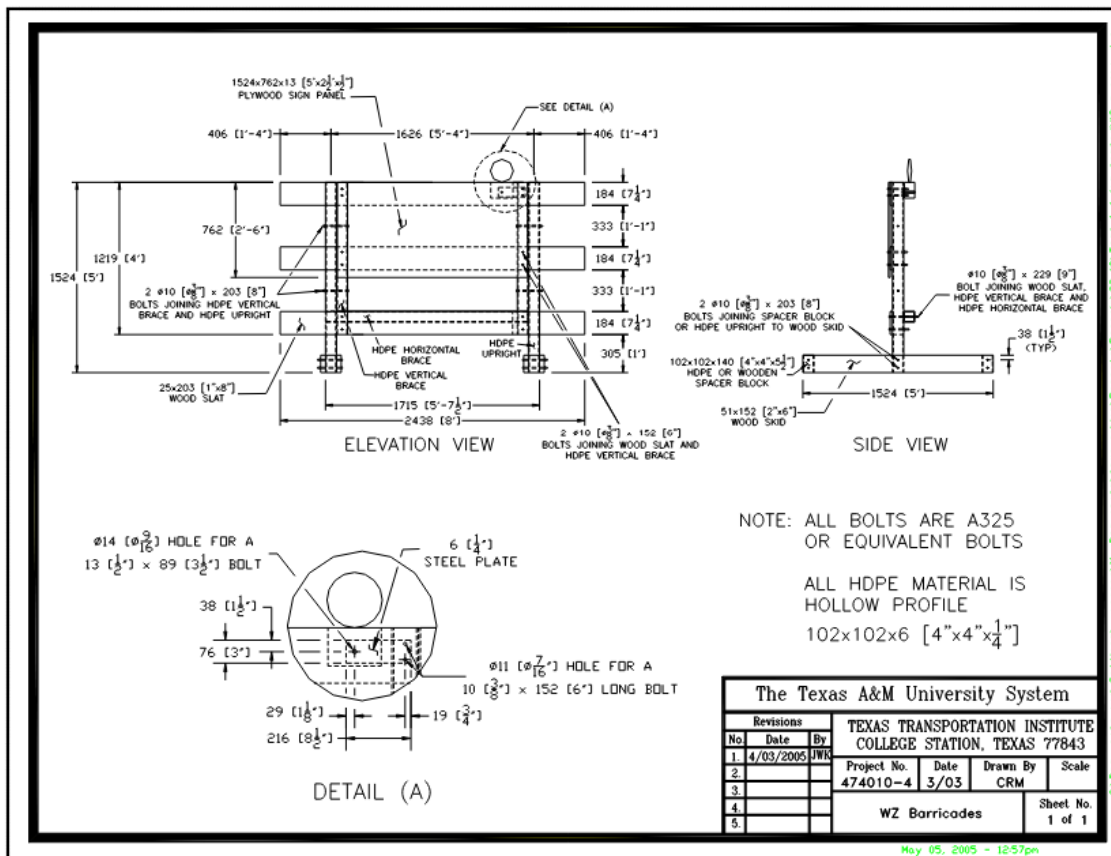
Details of Type III Barricade Evaluated in Test 4 (3)
